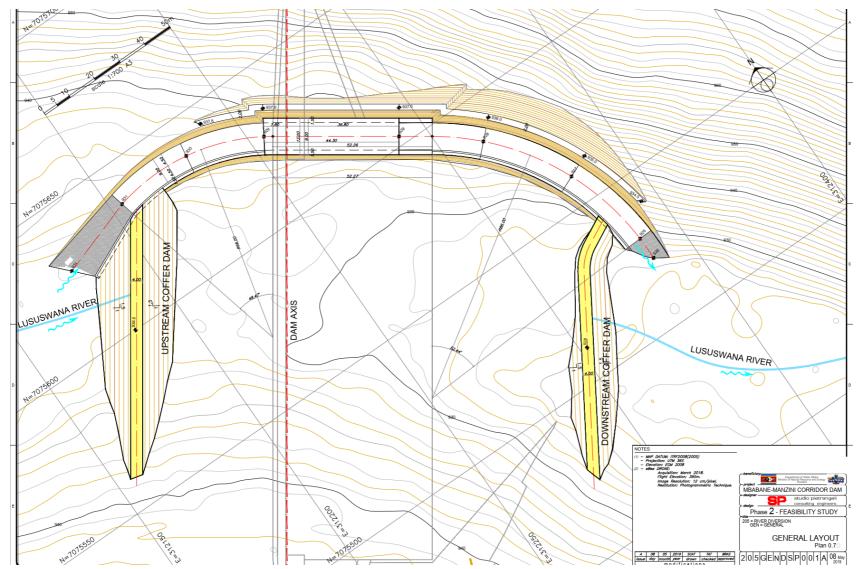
Layout of the Diversion Works (Studio Pietrangeli, 2019)
